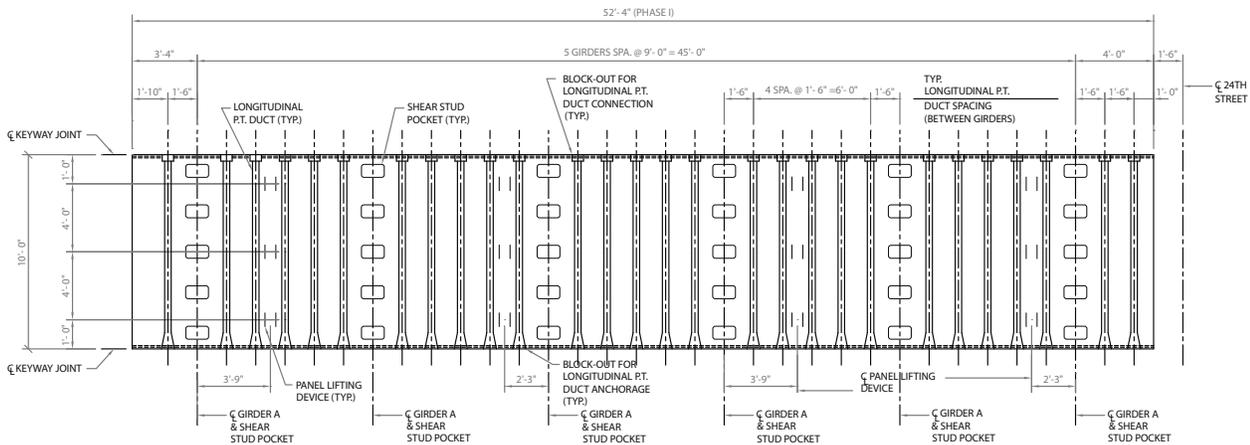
Panel layout of the 24<sup>th</sup> Street Bridge.
